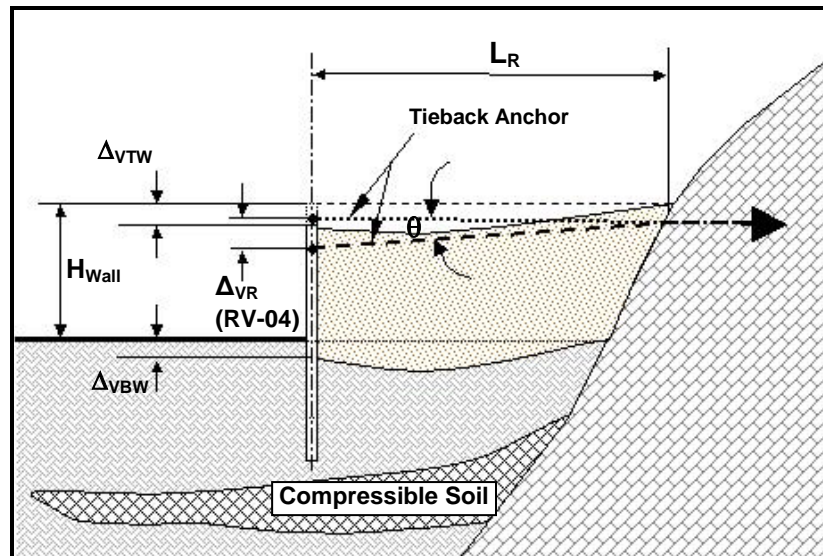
, ERS Tieback Anchor - Transverse Differential Settlement
